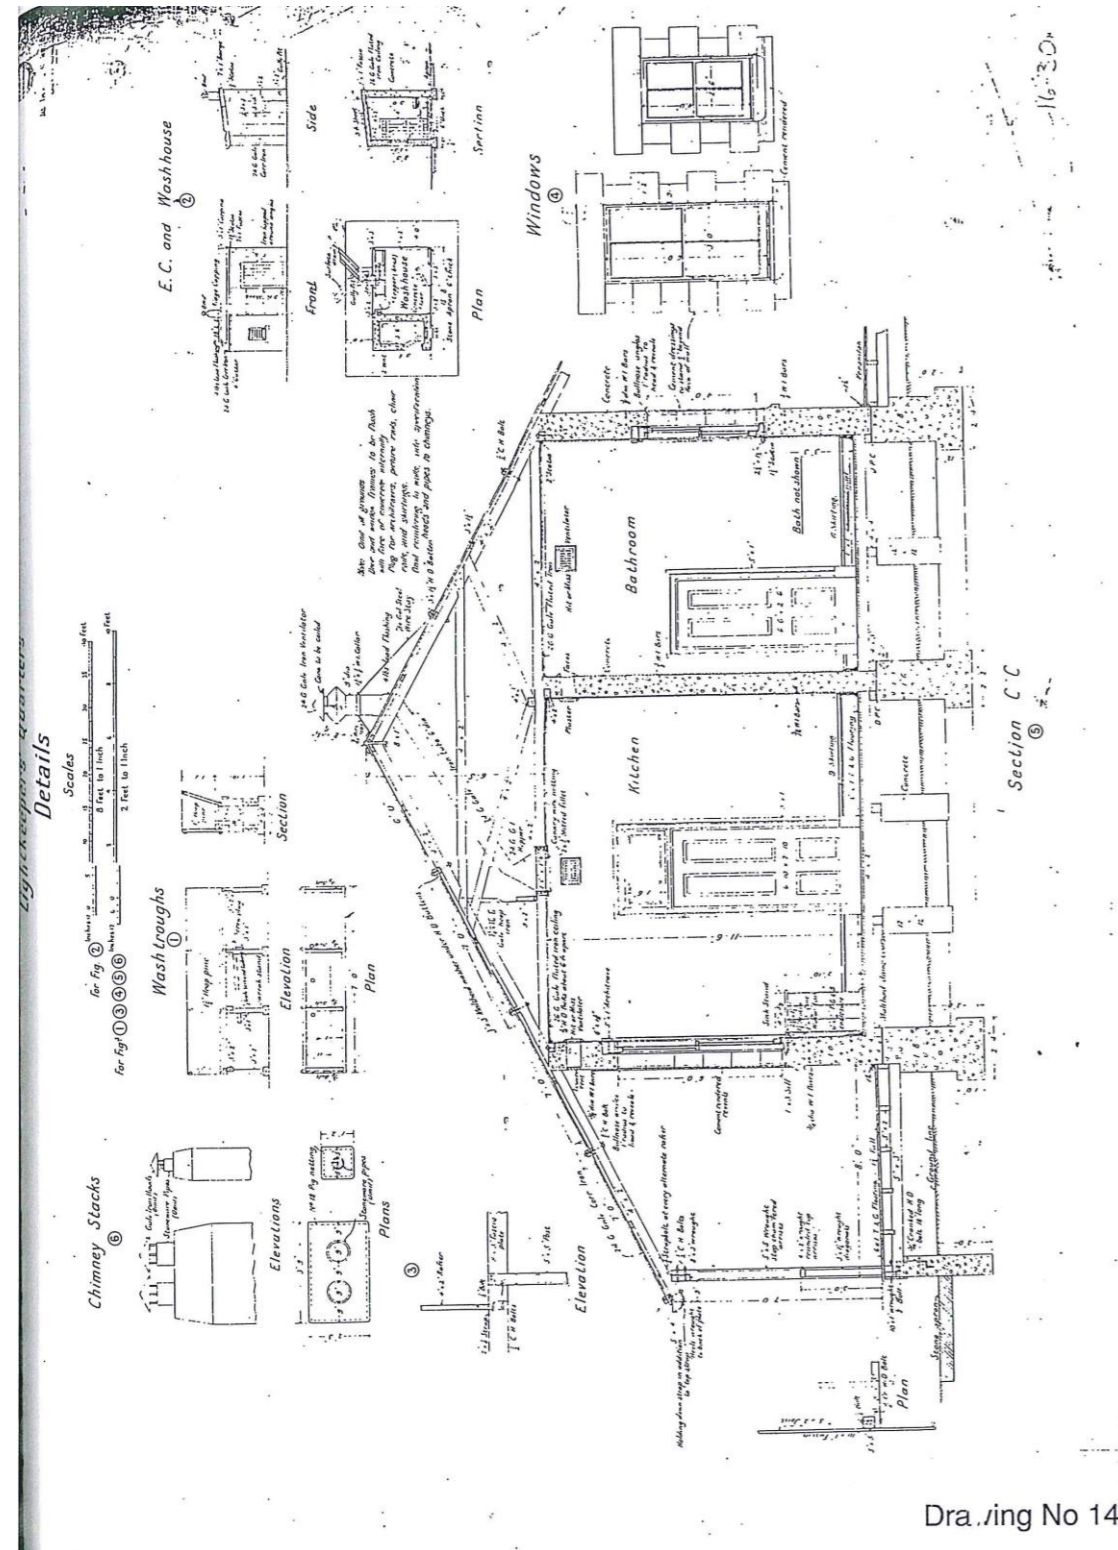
Lightkeepers Quarters Details & Section, Keen C, Conservation Plan
